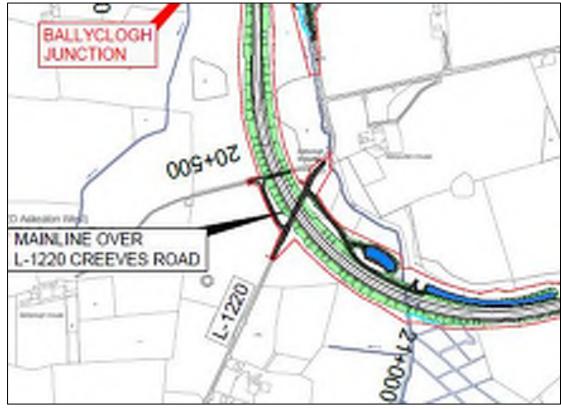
Bridge Proposed over Local Road L-1220 at Ballyclogh (as per November 2018 Design Update)
